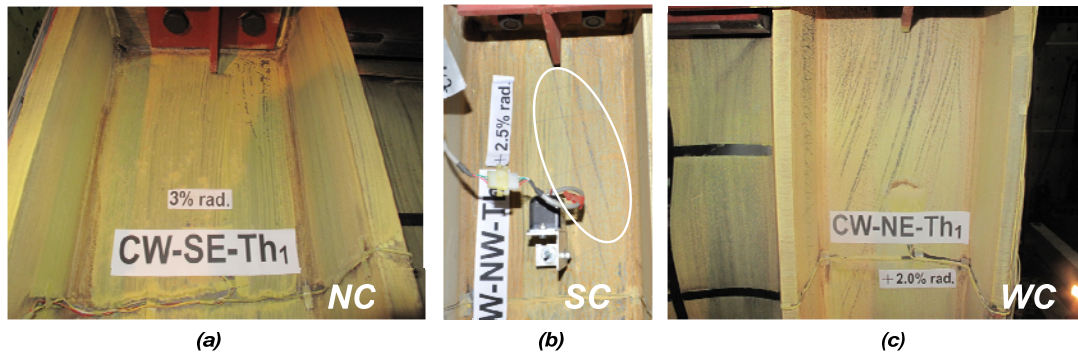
Conditions of the whitewashes at the top end of the columns in (a) Specimen NC (3% rad. roof drift); (b) Specimen SC (2.5% rad. roof drift) and (c) Specimen WC (2% rad. roof drift)
